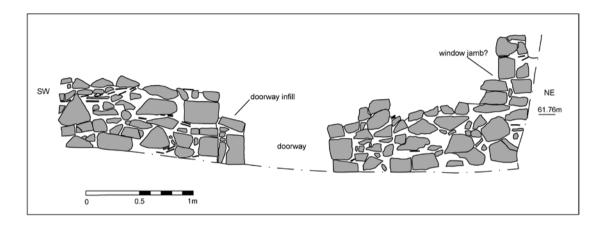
Area 1: Building 1 Wall 522: south-east elevation
